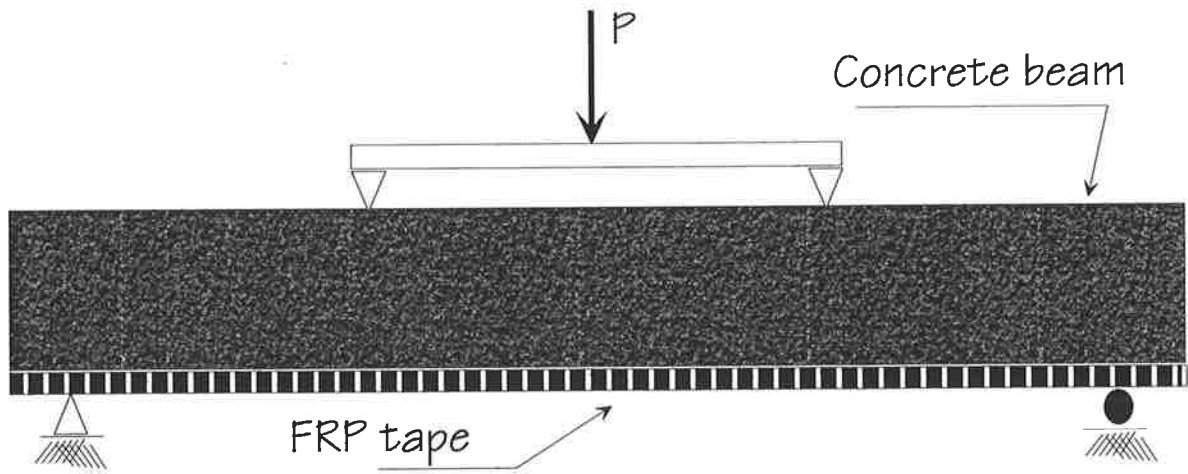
Concrete beam with CFRP sheet as an external reinforcement.
